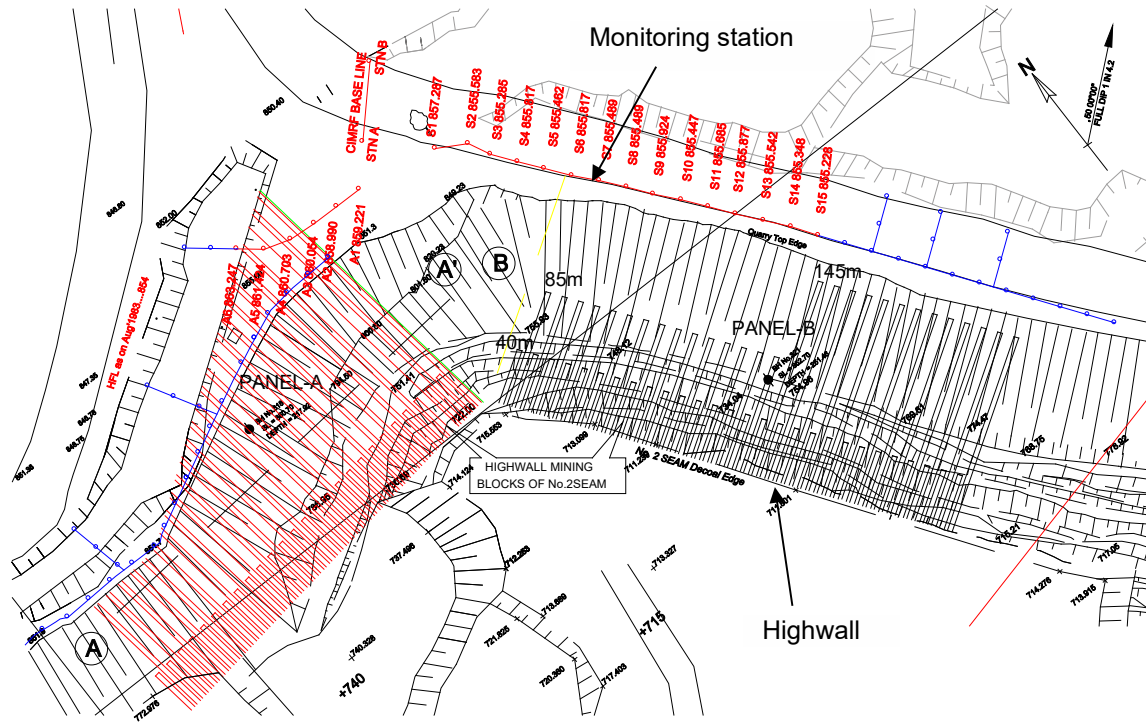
Plan showing layout of monitoring stations over highwall panels, OC-II, SCCL
